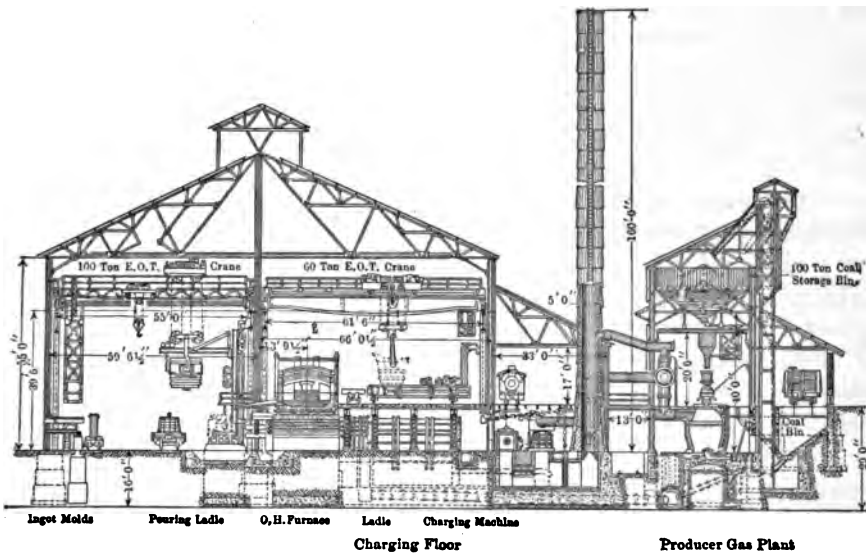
Transverse Section of an Open-hearth Plant at South Works of the Illinois Steel Co., Chicago.
